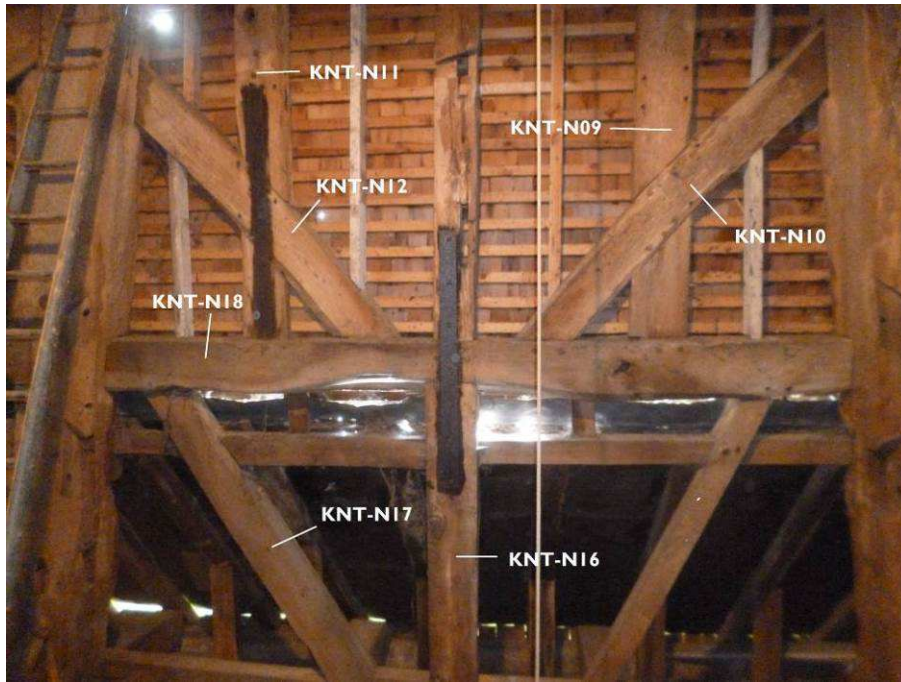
West wall of tower at mid level, showing the location of samples KNT-N09–12 and KNT-N16–18
